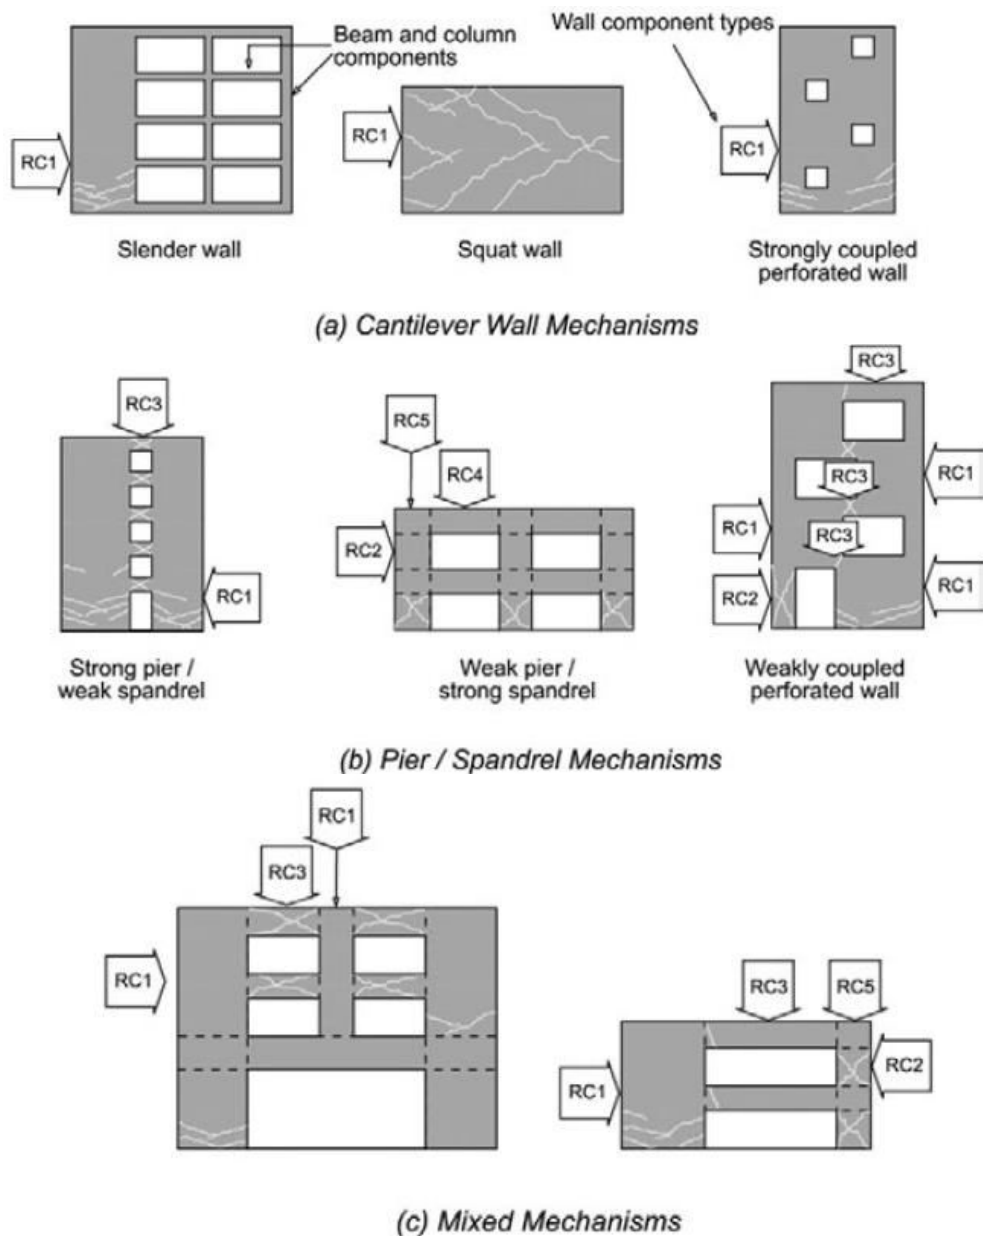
22: Identification of component types in the concrete shear wall elements (FEMA 306 (1998b))
